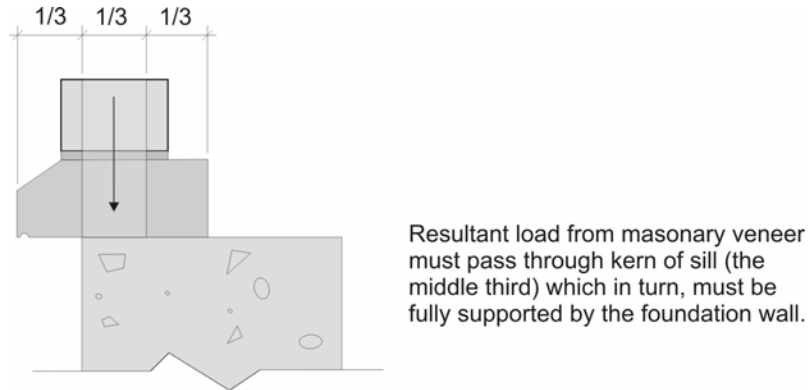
Structural basis for detailing of masonry sill or curb.
